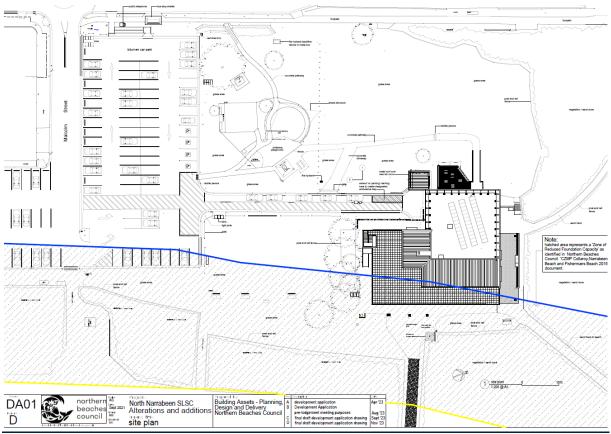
Site Plan for North Narrabeen SLSC Alterations and Additions (DA01-D)
